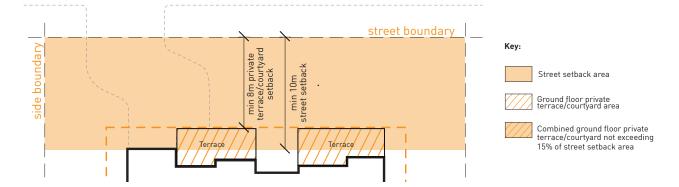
D.3-2: Controls for ground floor terrace area encroachment to the street setback area.
